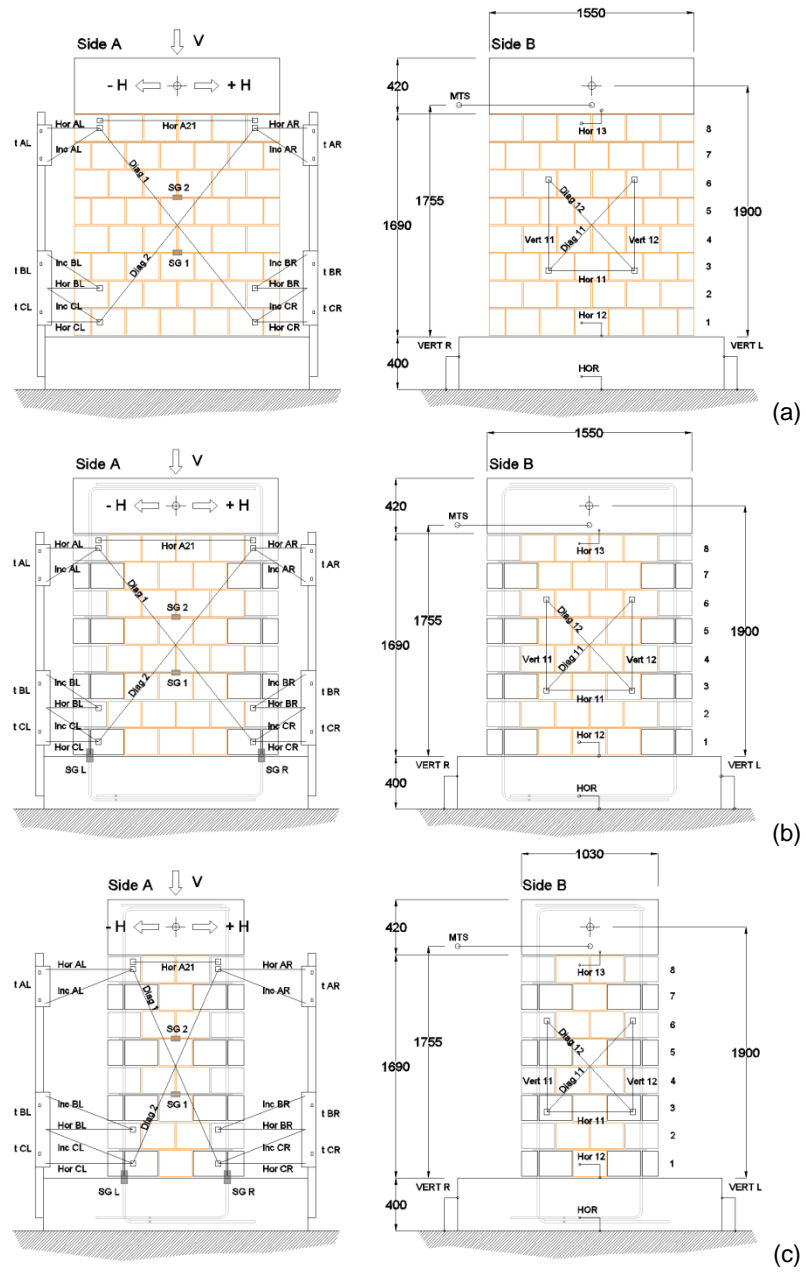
Specimens and scheme of instruments for shear compression tests: (a) plain masonry; (b) squat and (c) slender reinforced masonry walls.
